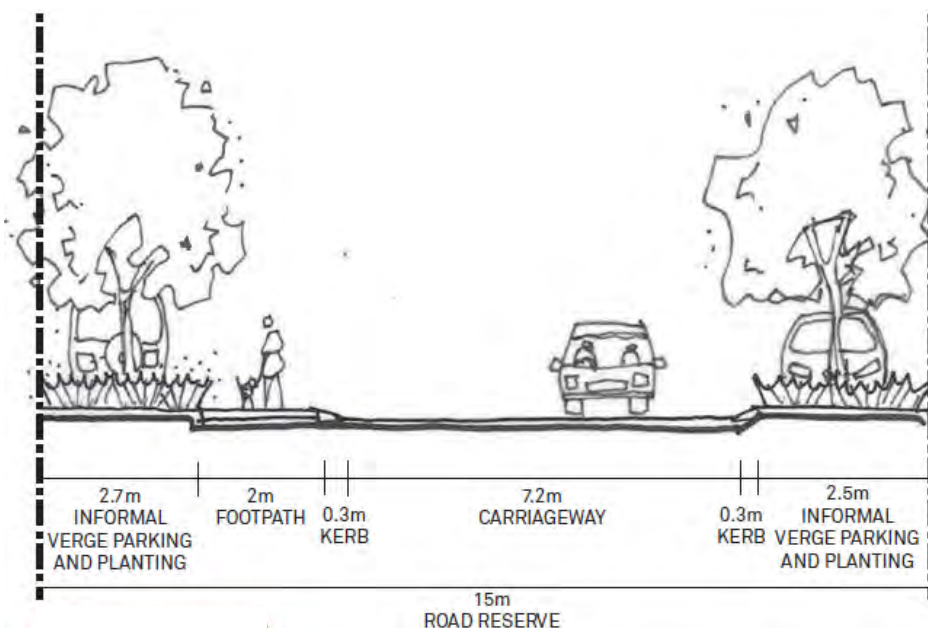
Road 1, 15 metre cross section east of Road 8 [Section (B)]
